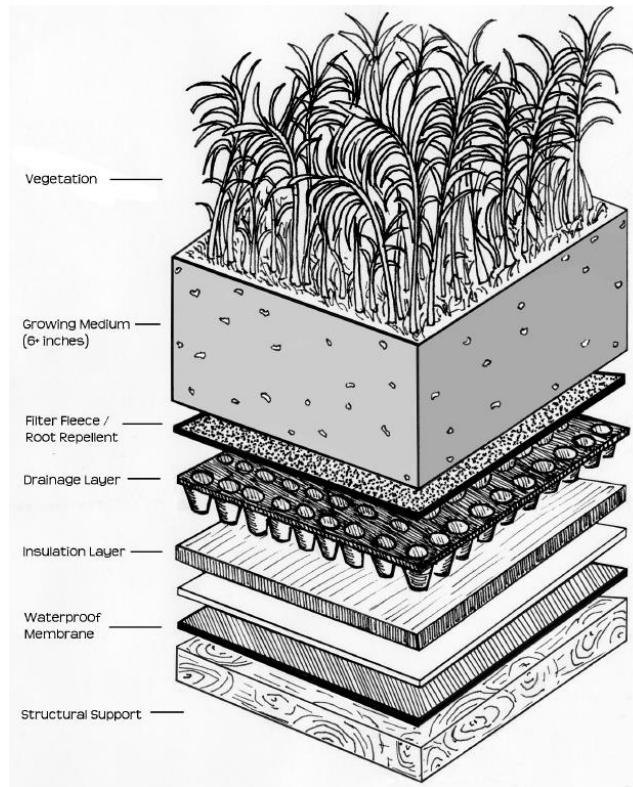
Intensive Green Roof Profile (Green Roof Plan, 2012)
